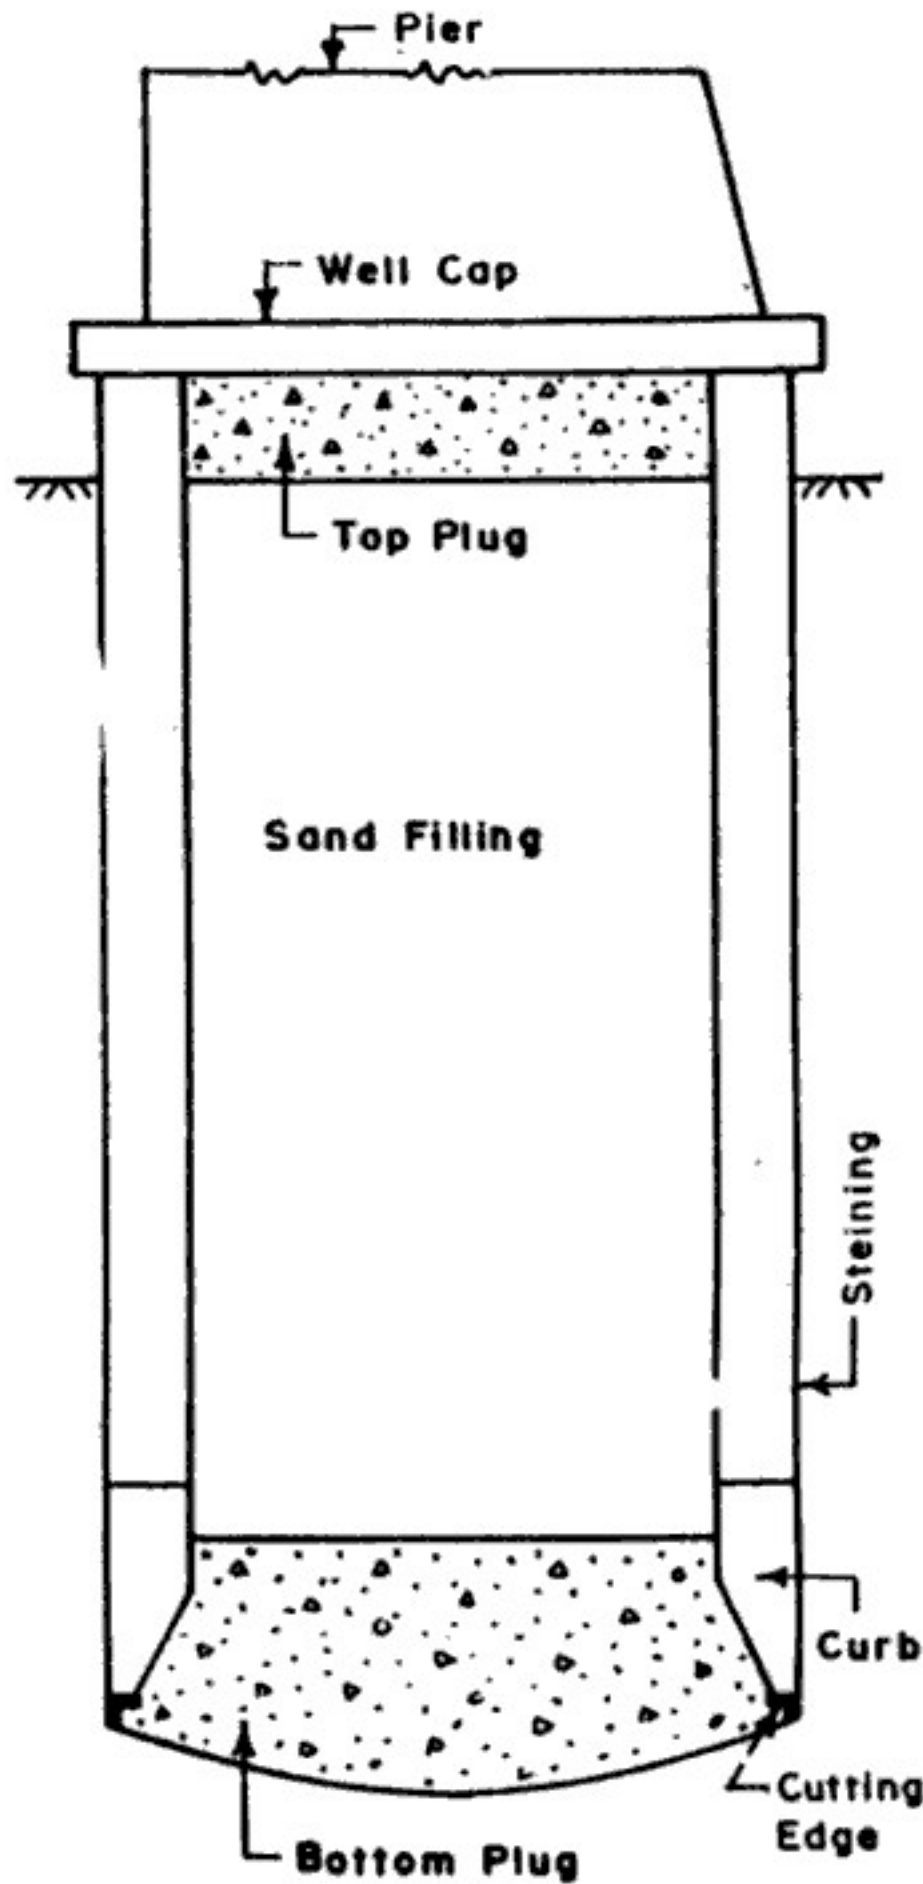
SECTION OF A WELL FOUNDATION.
